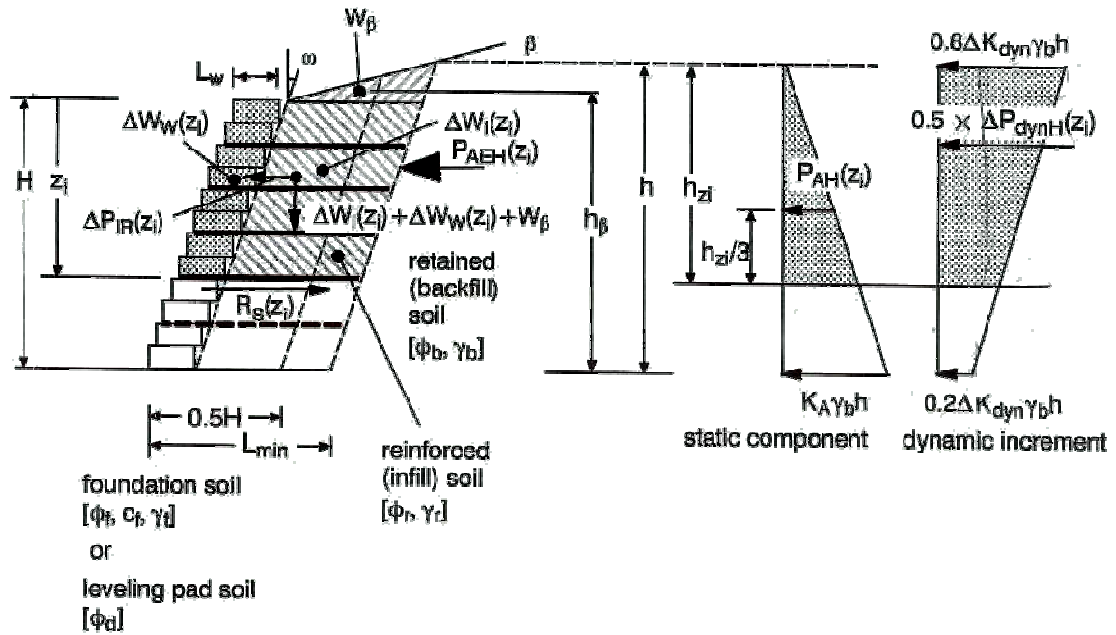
Geometry and forces used to calculate internal sliding of reinforcement layers in reinforced SRW structures
